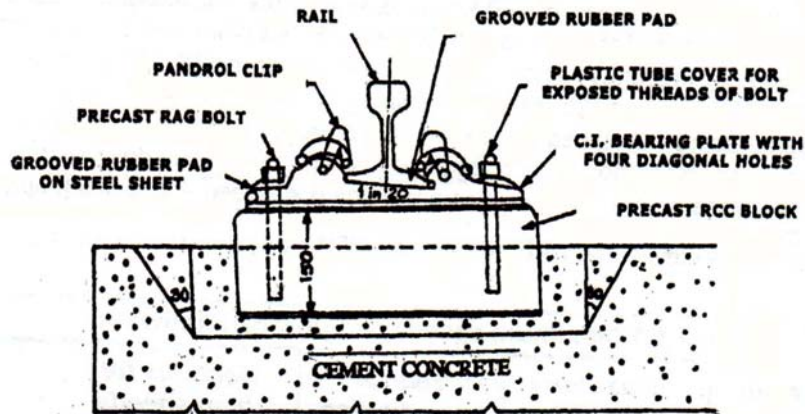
BALLASTLESS TRACK FOR UNDERGROUND RAILWAYS
